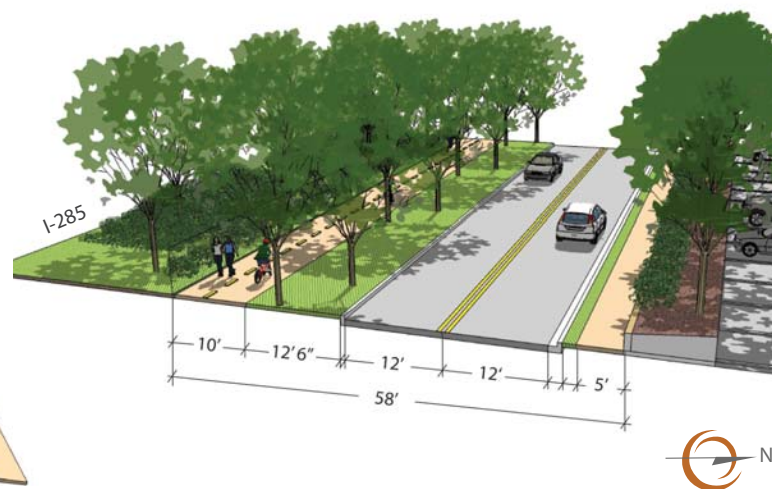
Proposed Option for Interstate North Parkway Cross Section - West of Powers Ferry Road
